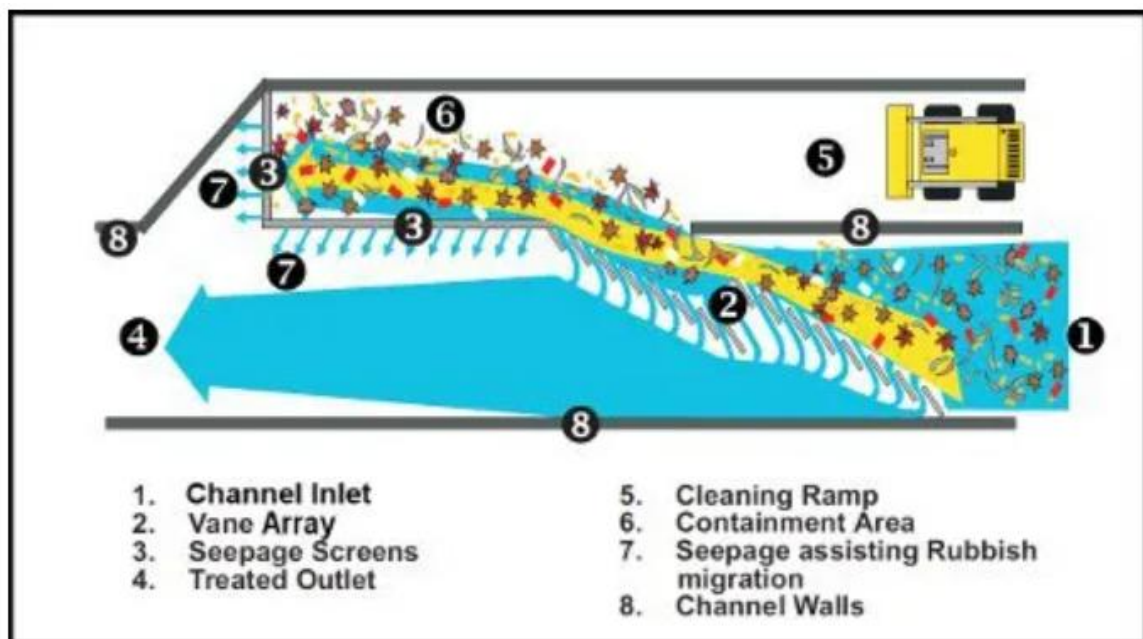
Potential Diversion Weir Arrangement (Source: Baramy, 2023)
